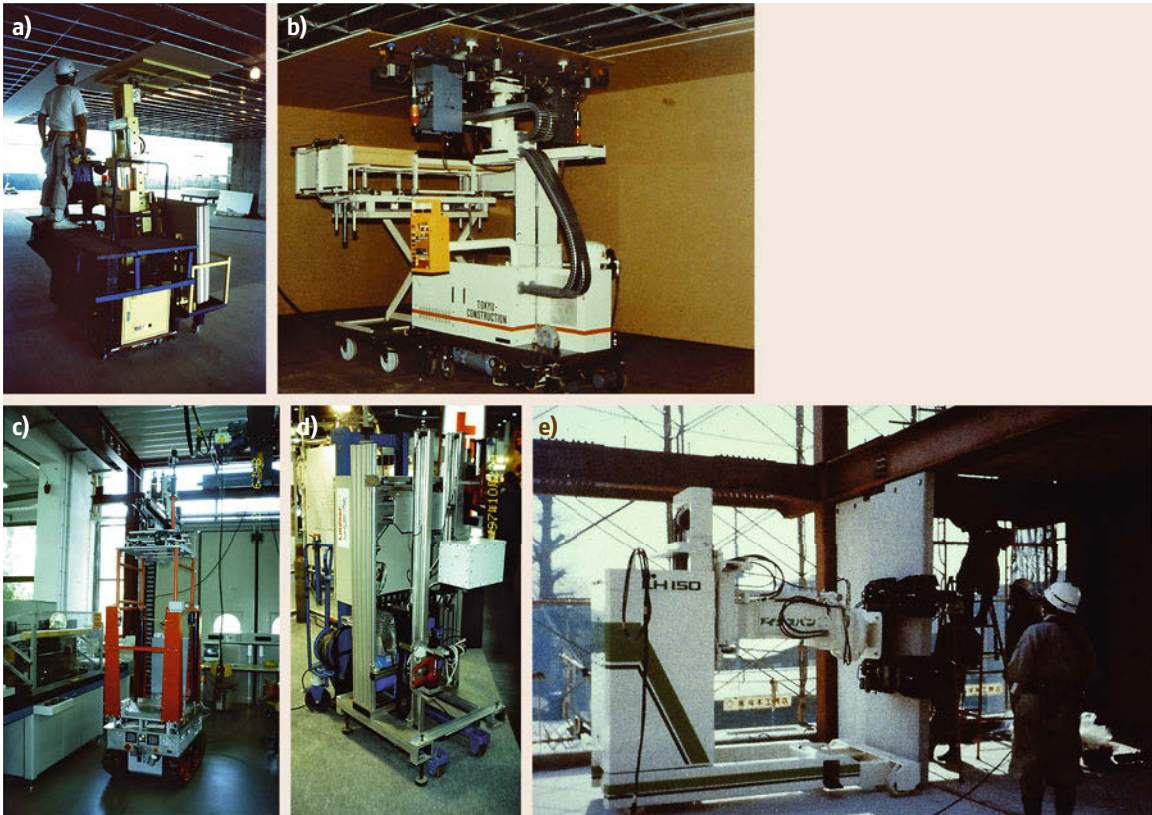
(a) Shimizu CFR 1 – Interior finishing robot; (b) the Tokyu ceiling panel installation robot; (c) BR2 TU Munich – modular ceiling drilling robot system type 1; (d) BR2 TU Munich – modular ceiling drilling robot system type 2; (e) Kajima interior wall setting – KOMATSU LH 150
